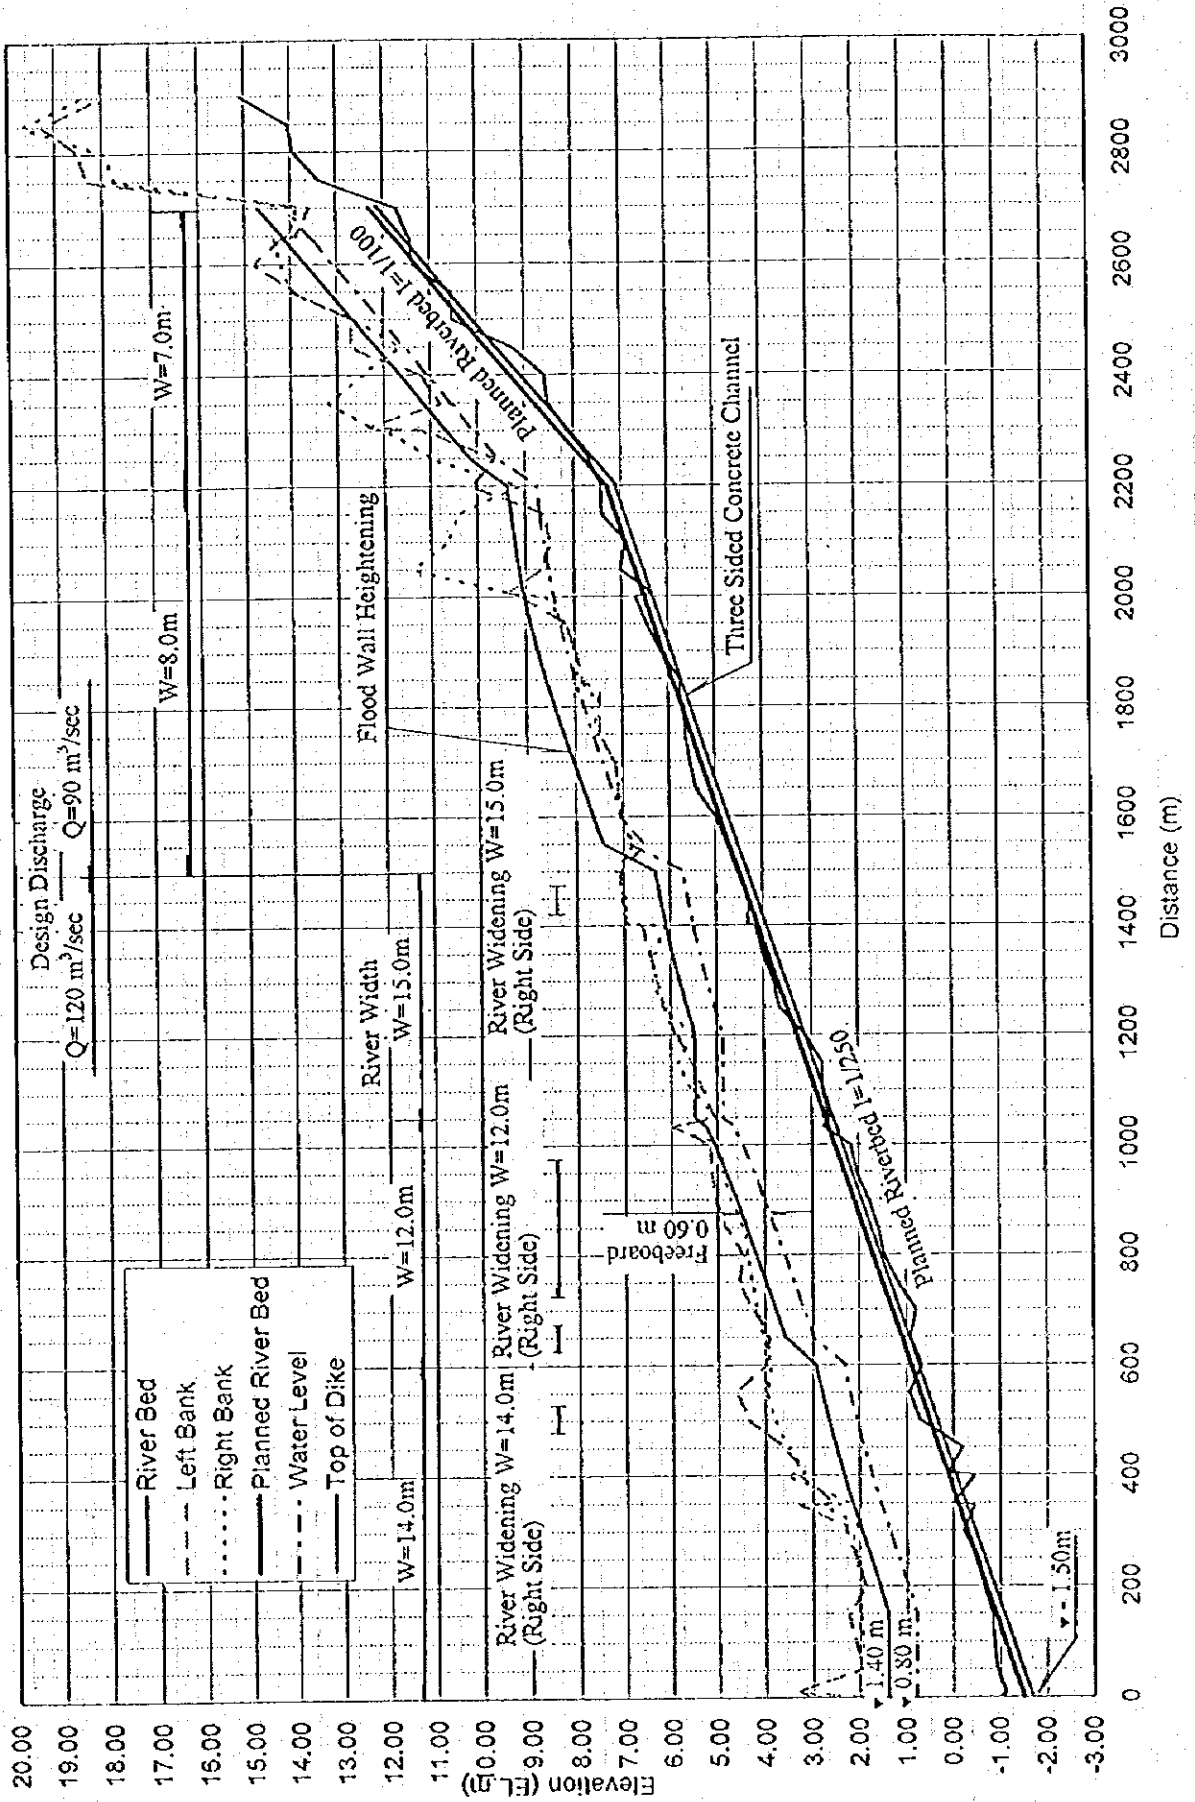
Longitudinal Section of Tomu River Improvement Plan
